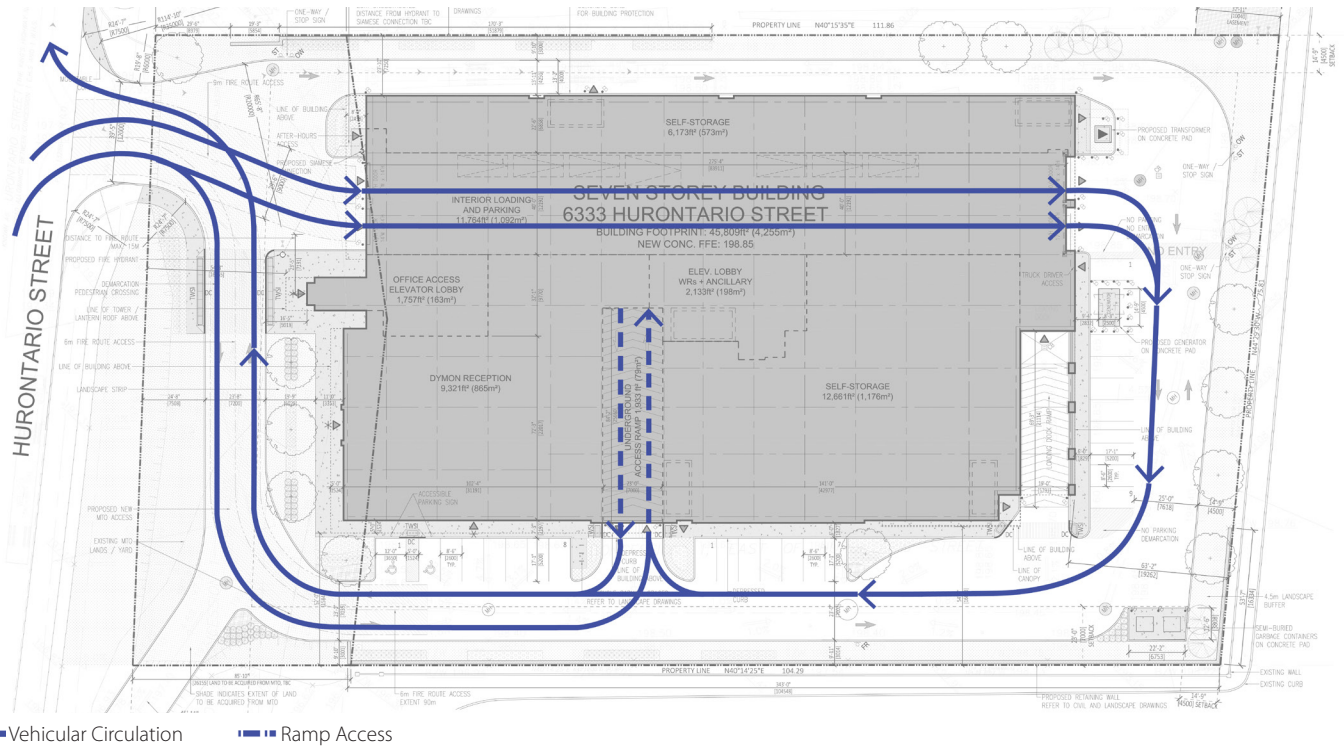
Surface and interior parking plan and vehicular circulation. Base plan by Nicolas Caragianis Architect
